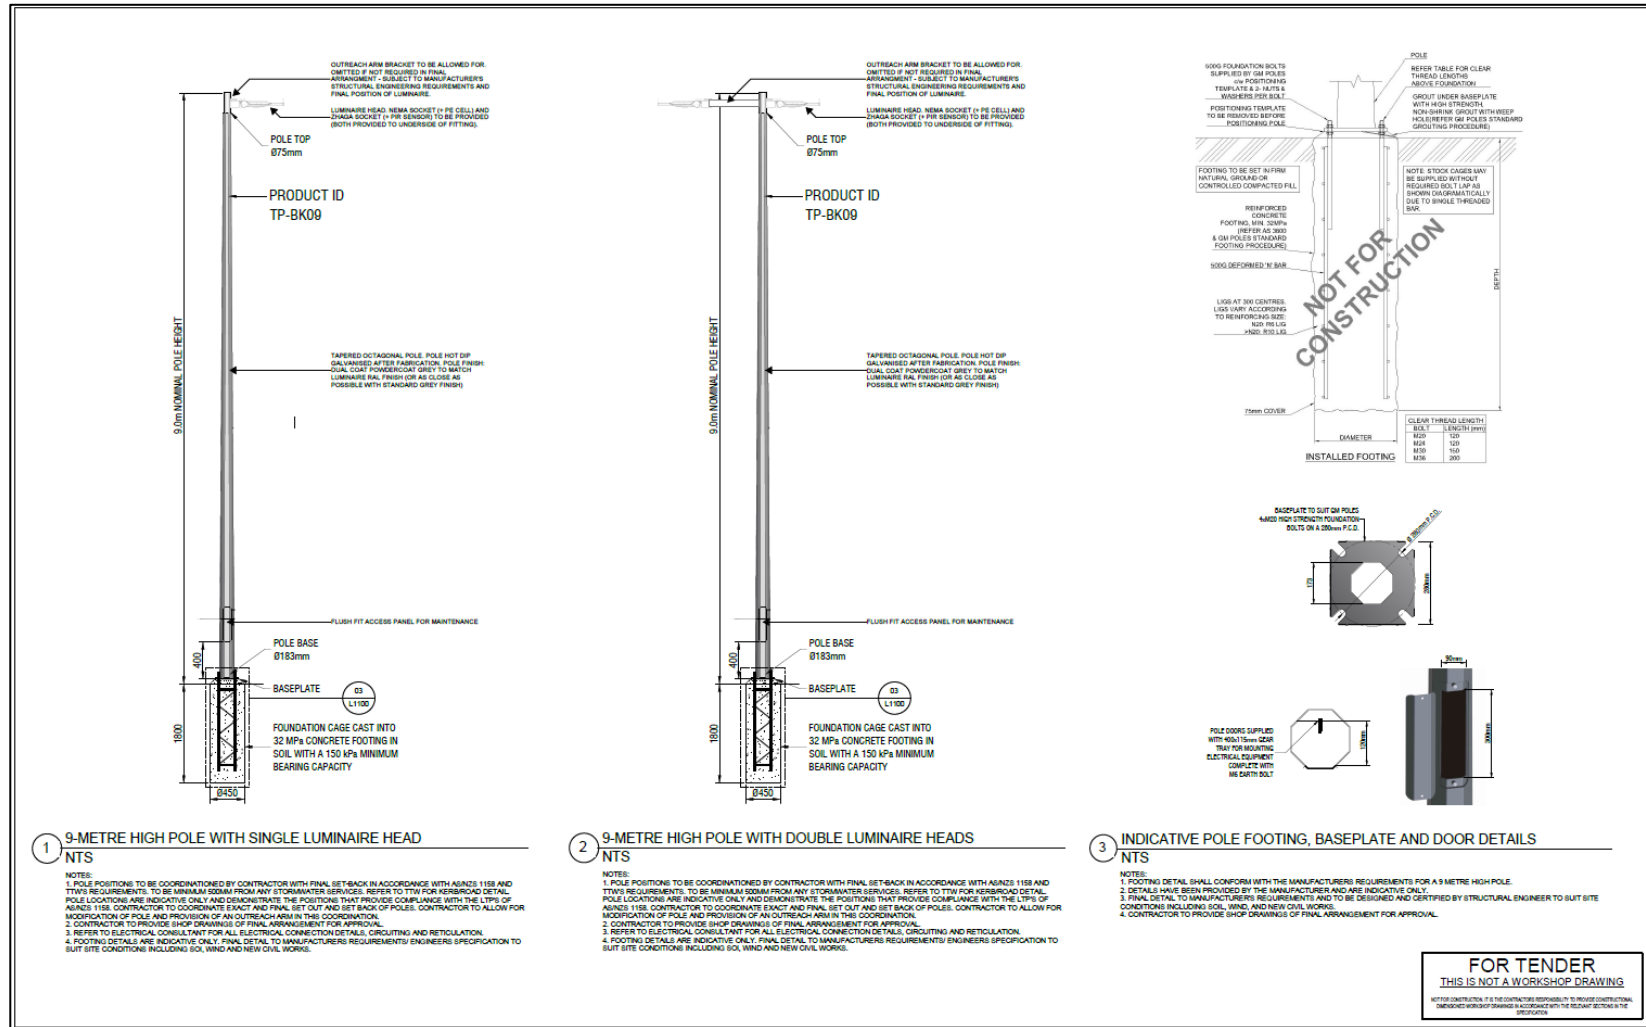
The technical details of the light poles to be installed in the proposed car parks, requiring a foundation cage cast concrete footing 450mm diameter and 1.8m depth. (Source: Steensen Varming Electrical).
